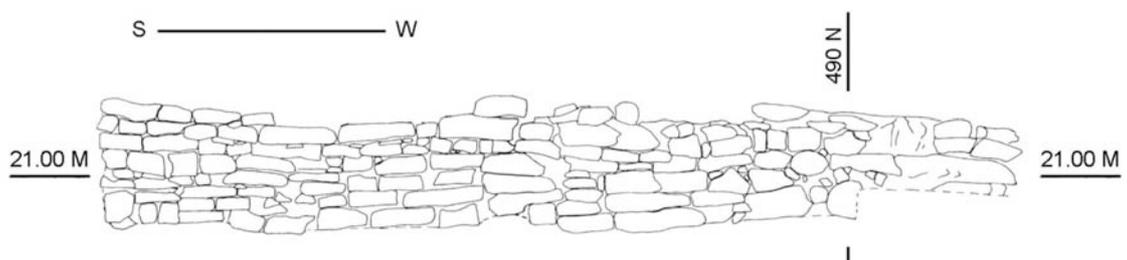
Area A, Square A 9/13. Elevation of the eastern face of Wall [2]. Scale 1:40.
